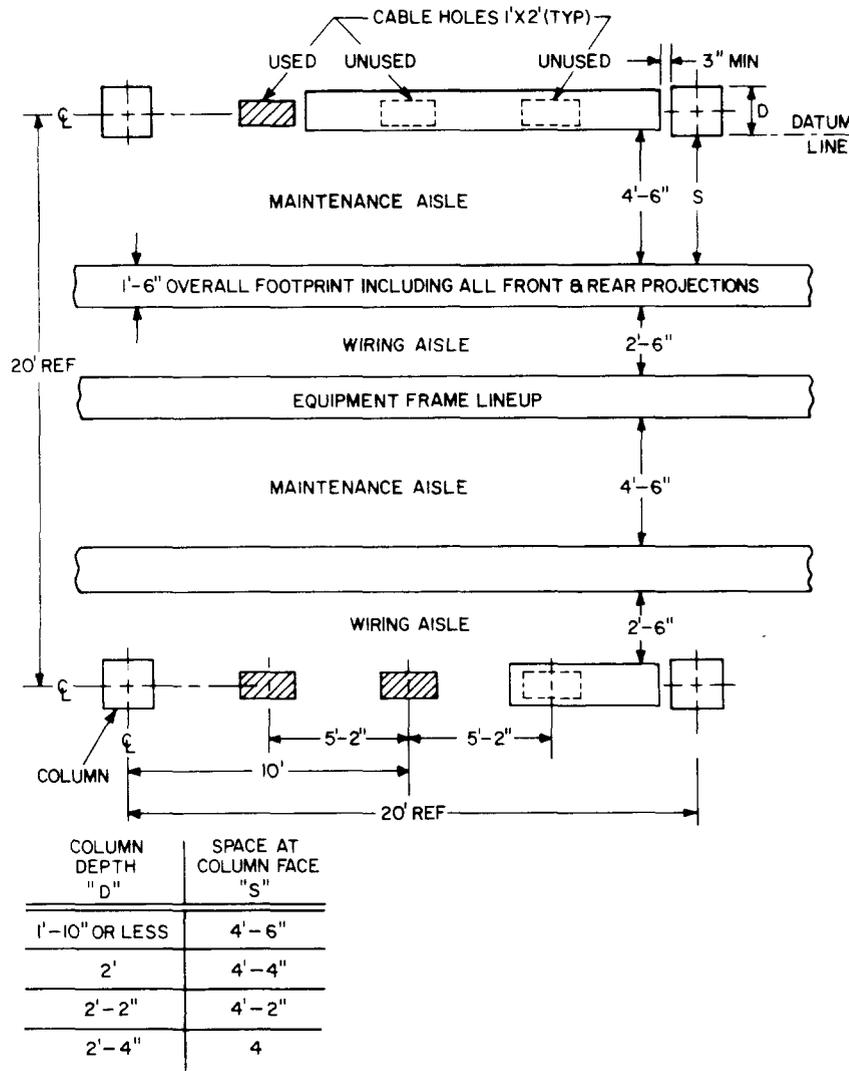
Typical Standard Floor Plan for 18-Inch Deep Frames
